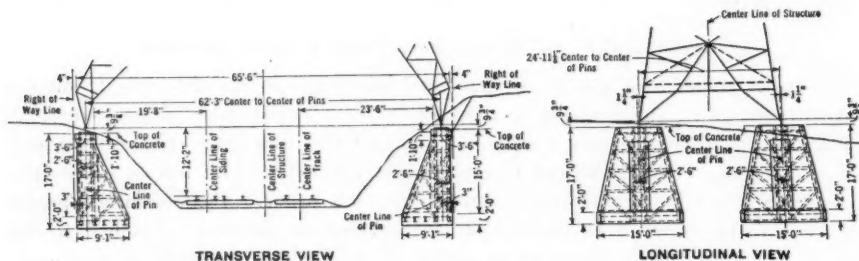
MODIFIED END POSTS OF A TYPE *R* BRIDGE STRUCTURE.
